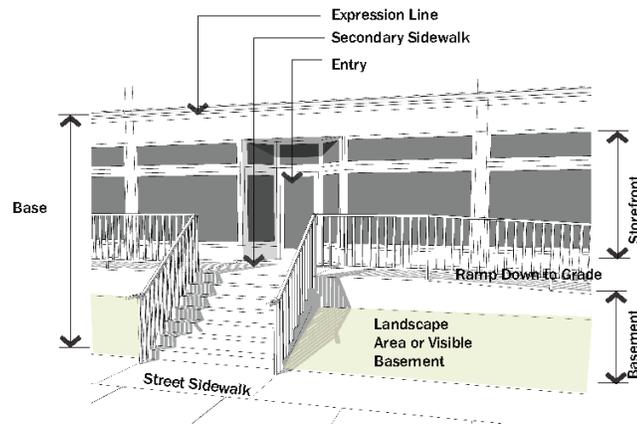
(2). Elevated Storefront Entrance Type.
